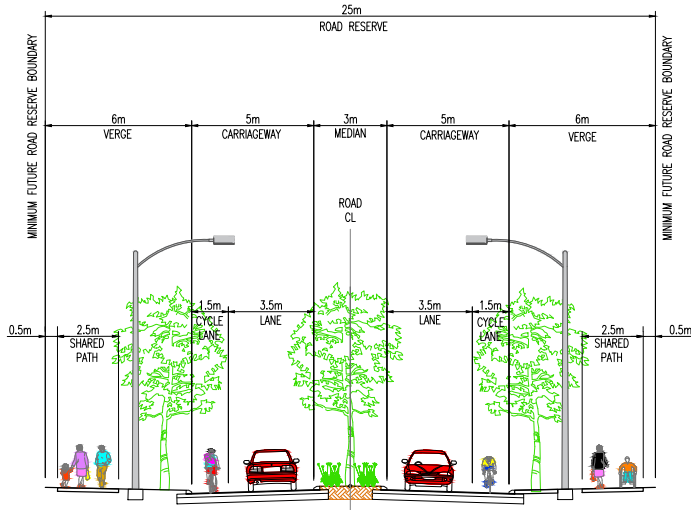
CROSS SECTION OF NEIGHBOURHOOD CONNECTOR A
